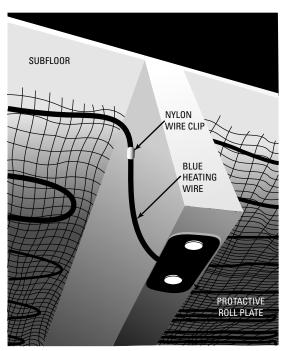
Extending a heating wire down and around a floor joist. (Courtesy Watts Radiant, Inc.)
